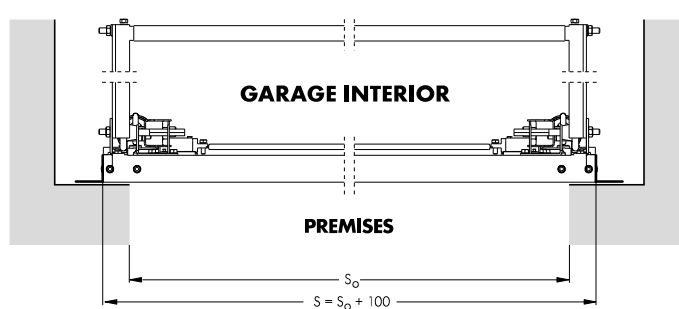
Installation behind the opening (horizontal section) of Novum, Progress, Komfort, Select, City, Connect doors.
